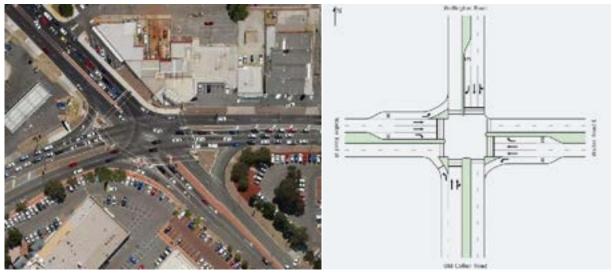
Walter Road/Wellington Road Intersection – Existing Geometry
